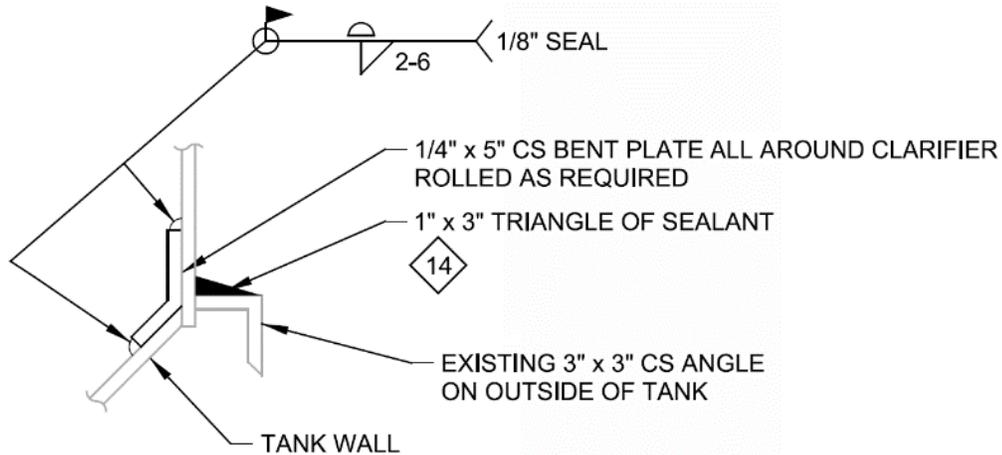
Example detail for adding a reinforcing plate and sealant to a tank wall.
